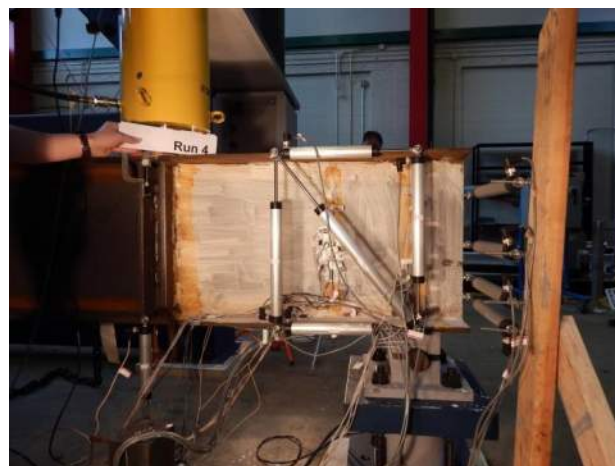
Undamaged Girder Left: 100 kip
